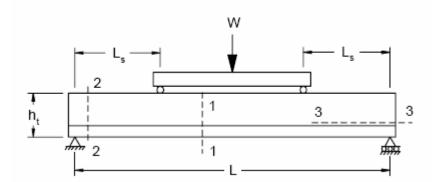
Geometric configuration of composite floor slab (Izzuddin, Tao and Elghazouli, 2004)
